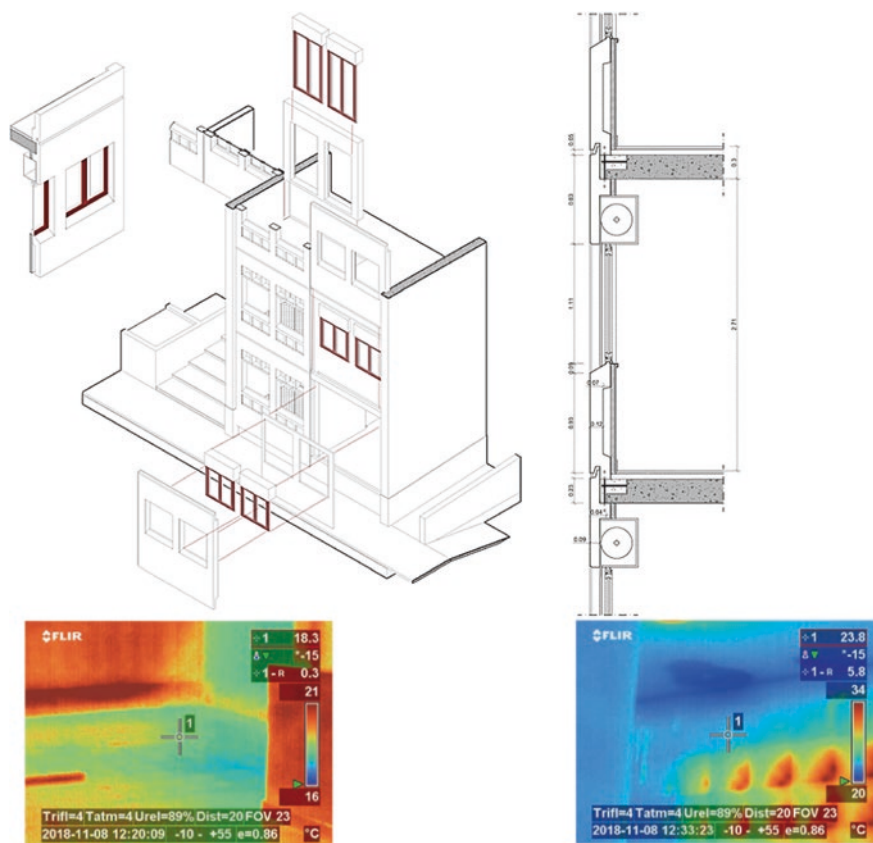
Actual situation: axonometric section and vertical section of the precast concrete panel façade (top); on-site thermography of water infiltrations (below)
